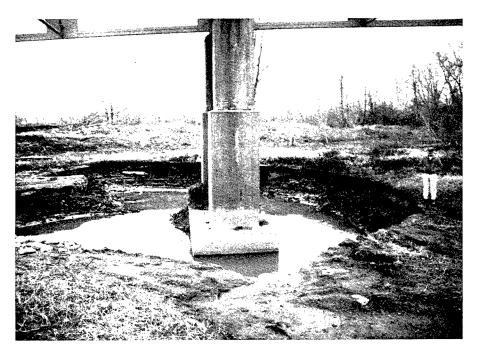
U.S. Highway 159 bridge pier located downstream of pier shown in Figure 3.45.
